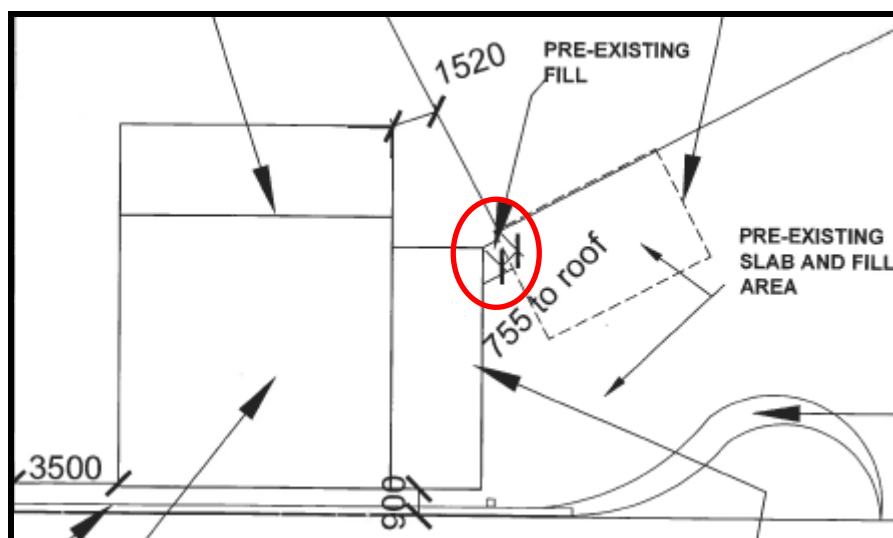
Excerpt of the site plan showing the floor layout of the proposal and the 0.75m side boundary setback, in relation to the south-eastern elevation of the proposal
